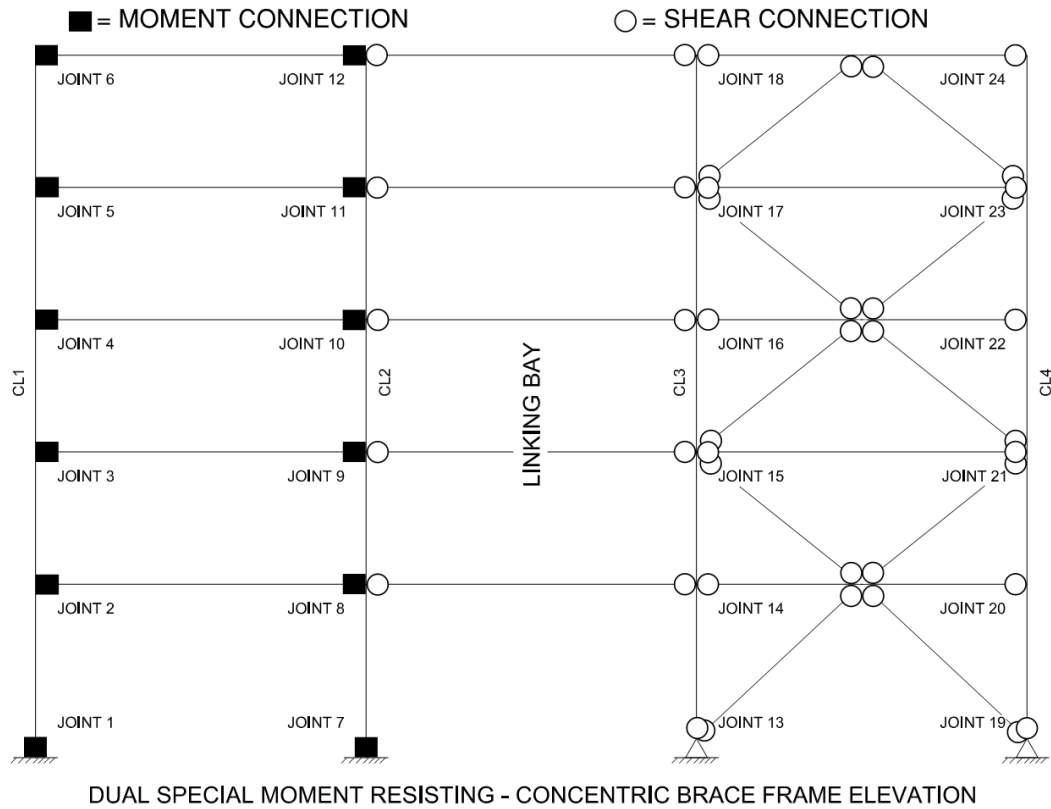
Frame Elevations with Joint and Column Labels (Dual System Frame)
